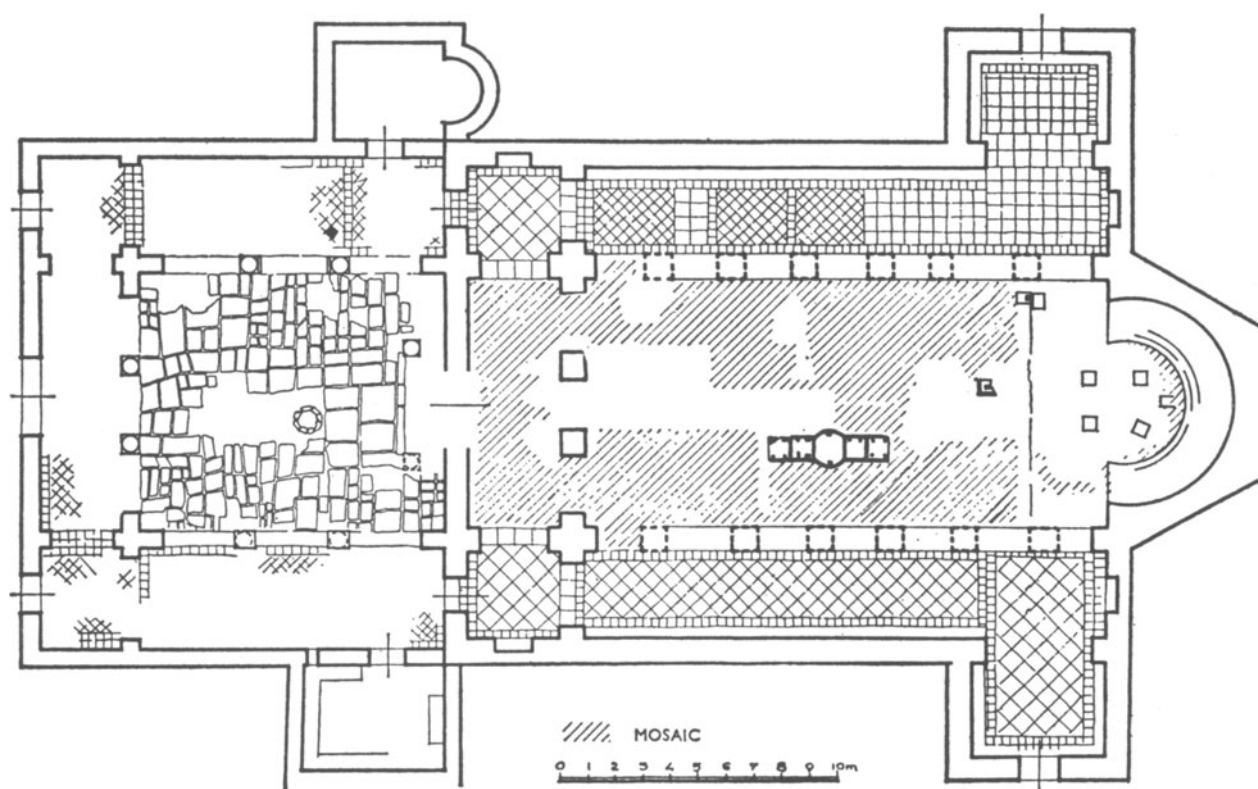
SOUTH CHURCH, CARIČIN GRAD. Plan showing paved and mosaic areas of the floor
